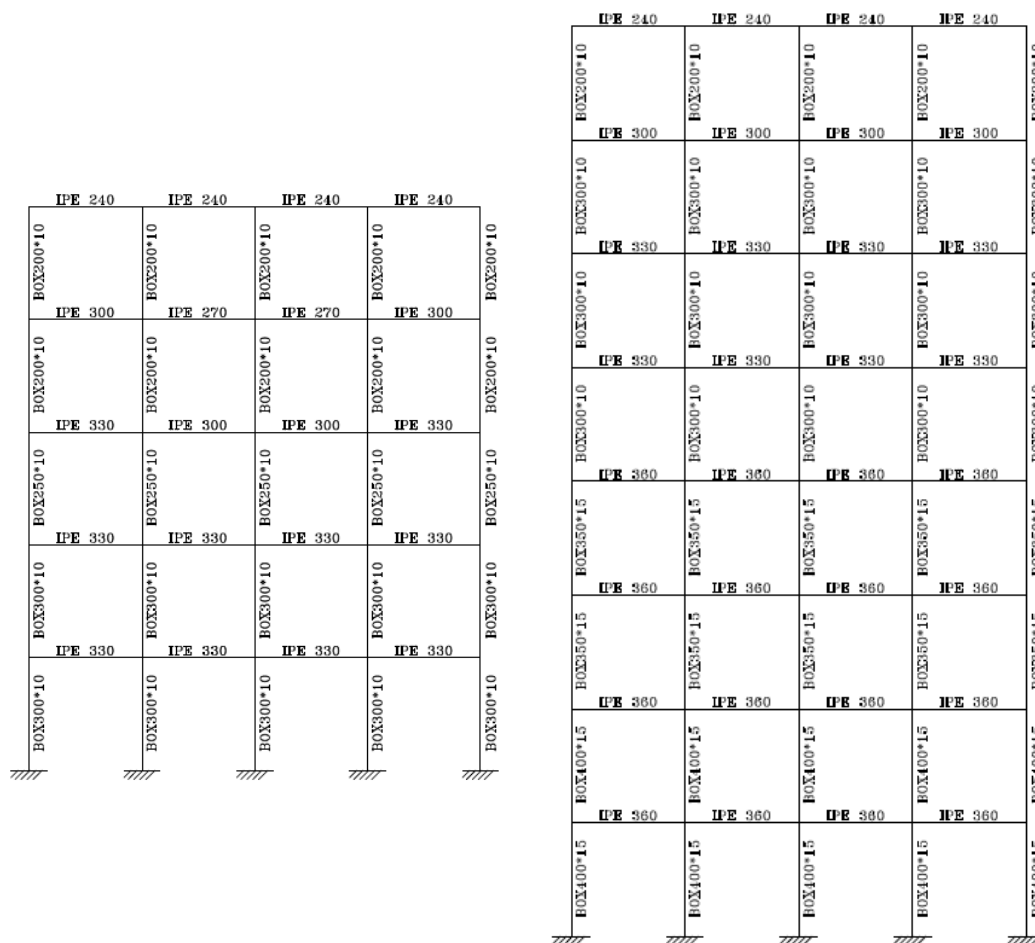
Cross sections of structural members of five-story and eight-story buildings.
